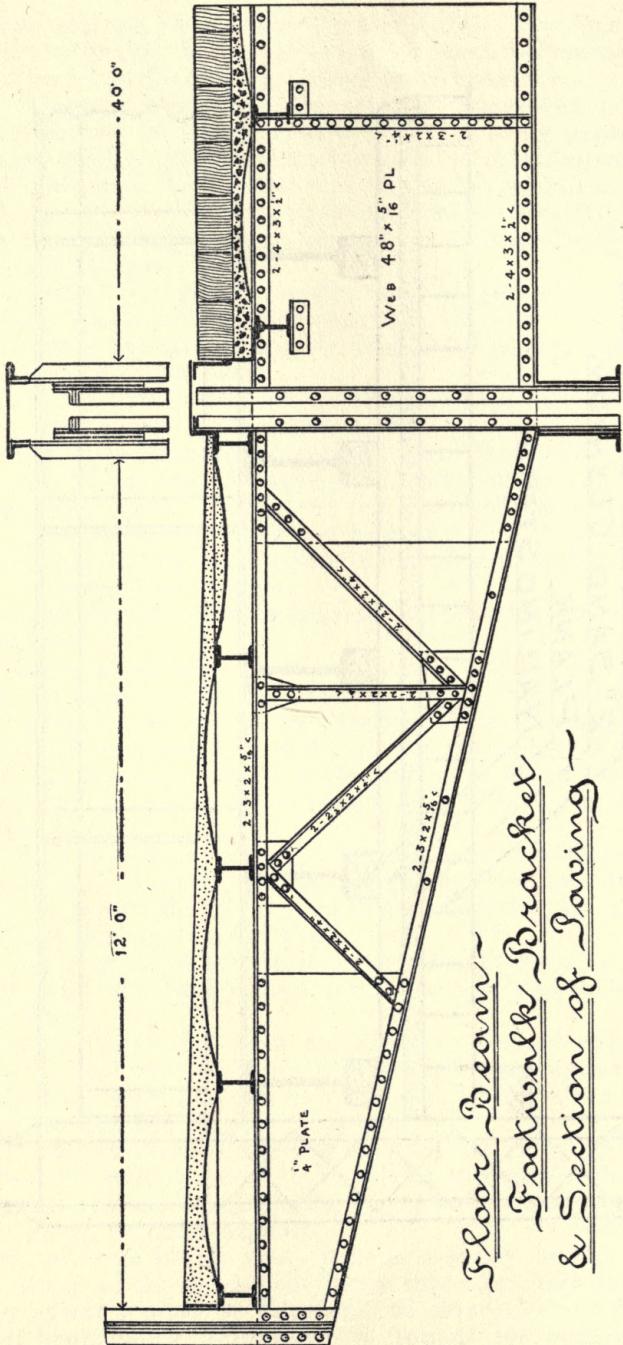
BUCKLE PLATE BRIDGE FLOOR.
